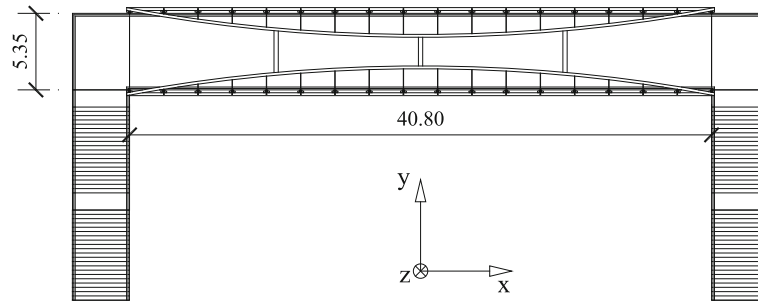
Plan view of the pedestrian bridge with two stairways at the ends
